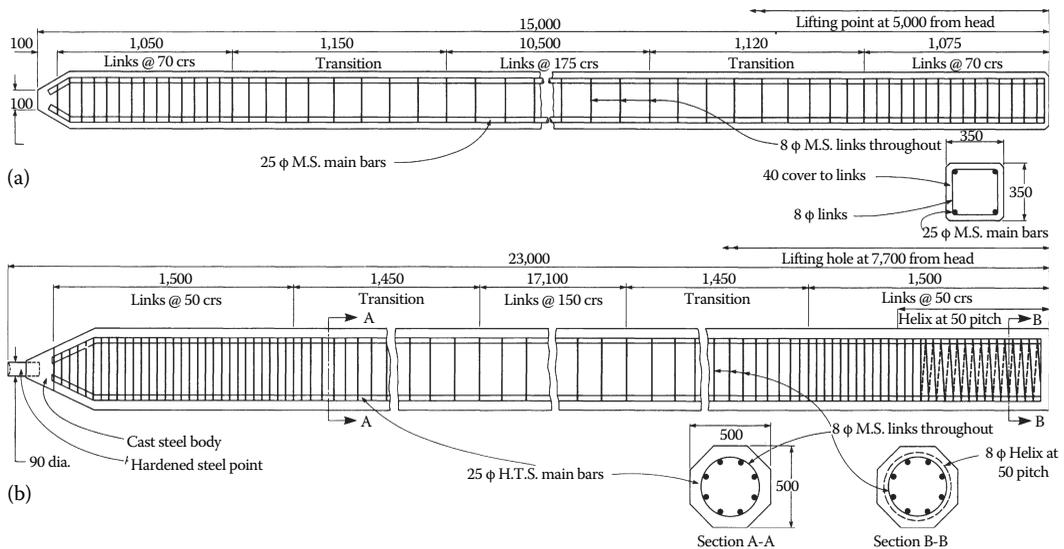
Design for precast concrete piles (a) 350 mm square pile, 15 m long (b) 500 mm octagonal pile, 23 m long.
